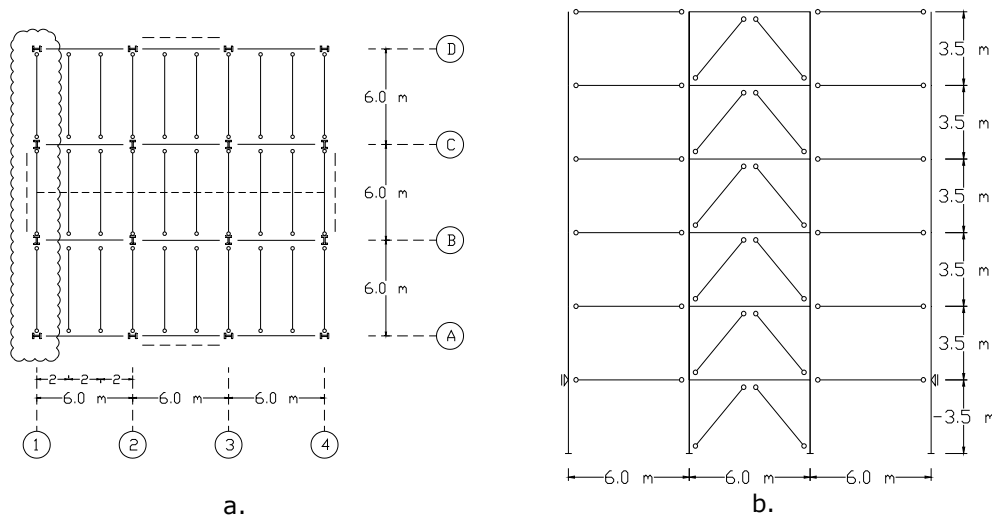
Frame geometry: a) Plan layout; b) Selected frame
